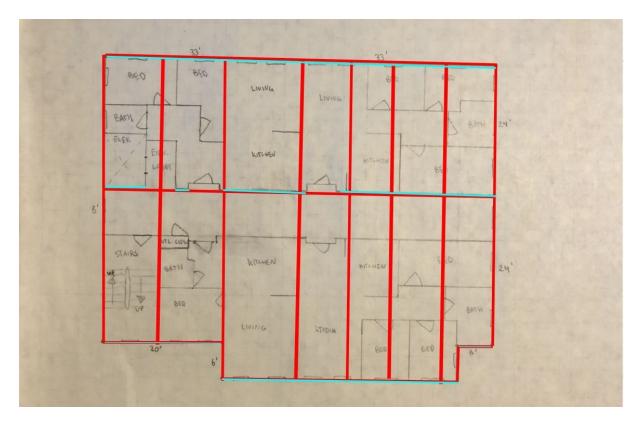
Timber Frame Floor Plan with Panel and Bearing Wall Overlay
